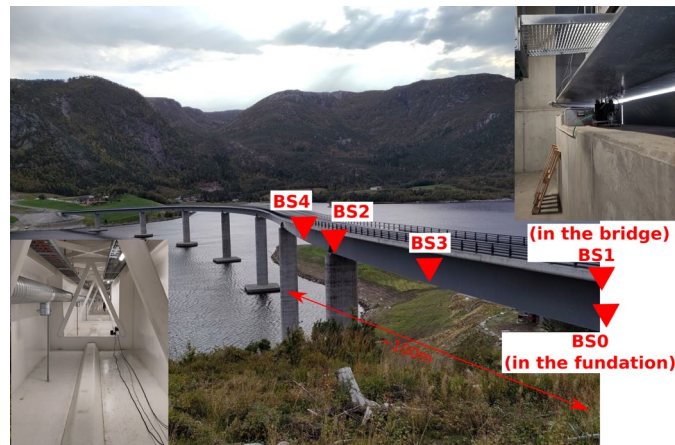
Setup of the experiment at the Astfjord Bridge close to Trondheim, Norway. Each one of the red triangles symbolizes a 6C sensor. One sensor (BS0) was installed in the concrete base in the foundation of the bridge (inlay at the upper right). The other four sensors (BS1, BS2, BS3 and BS4) were installed in the steel casing of the bridge (inlay at the lower left).
